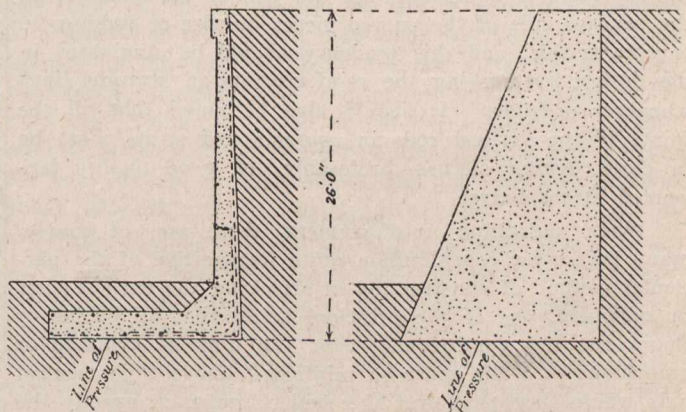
Comparison between Amount of Material required and useful space occupied in Mass Concrete and Reinforced Concrete Dock or Retaining Walls.
